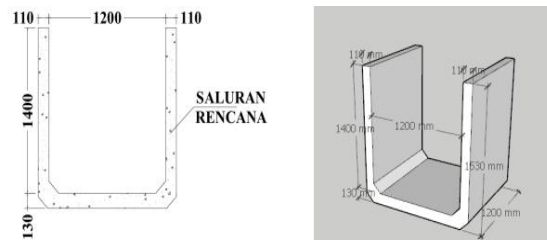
Layout 2D & 3D of Open Channel Plan Dimensions
